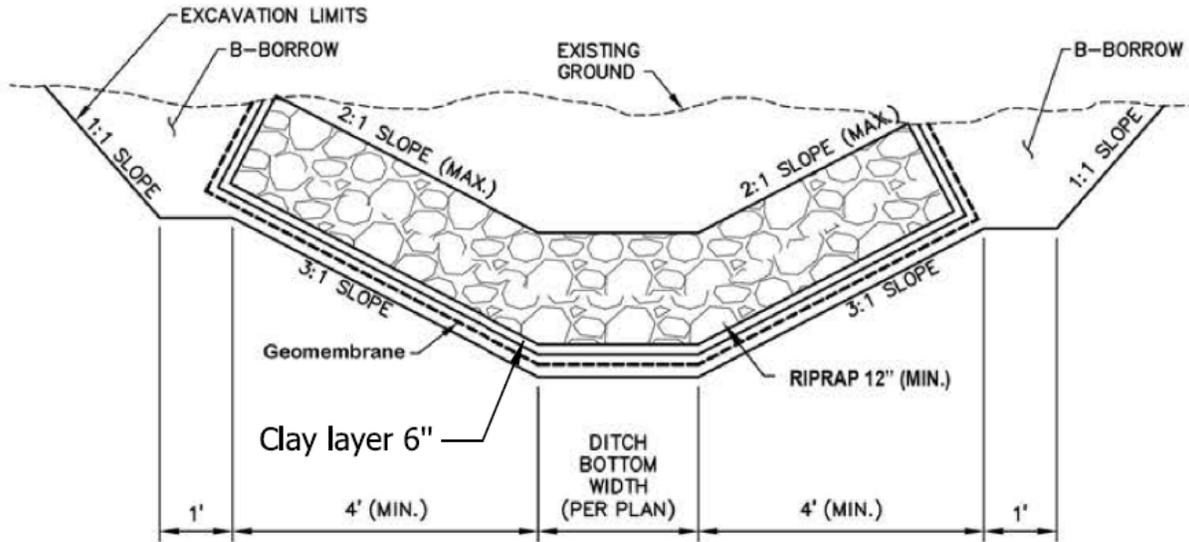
Typical lined drainage ditch with clay layer protection (not to scale)
